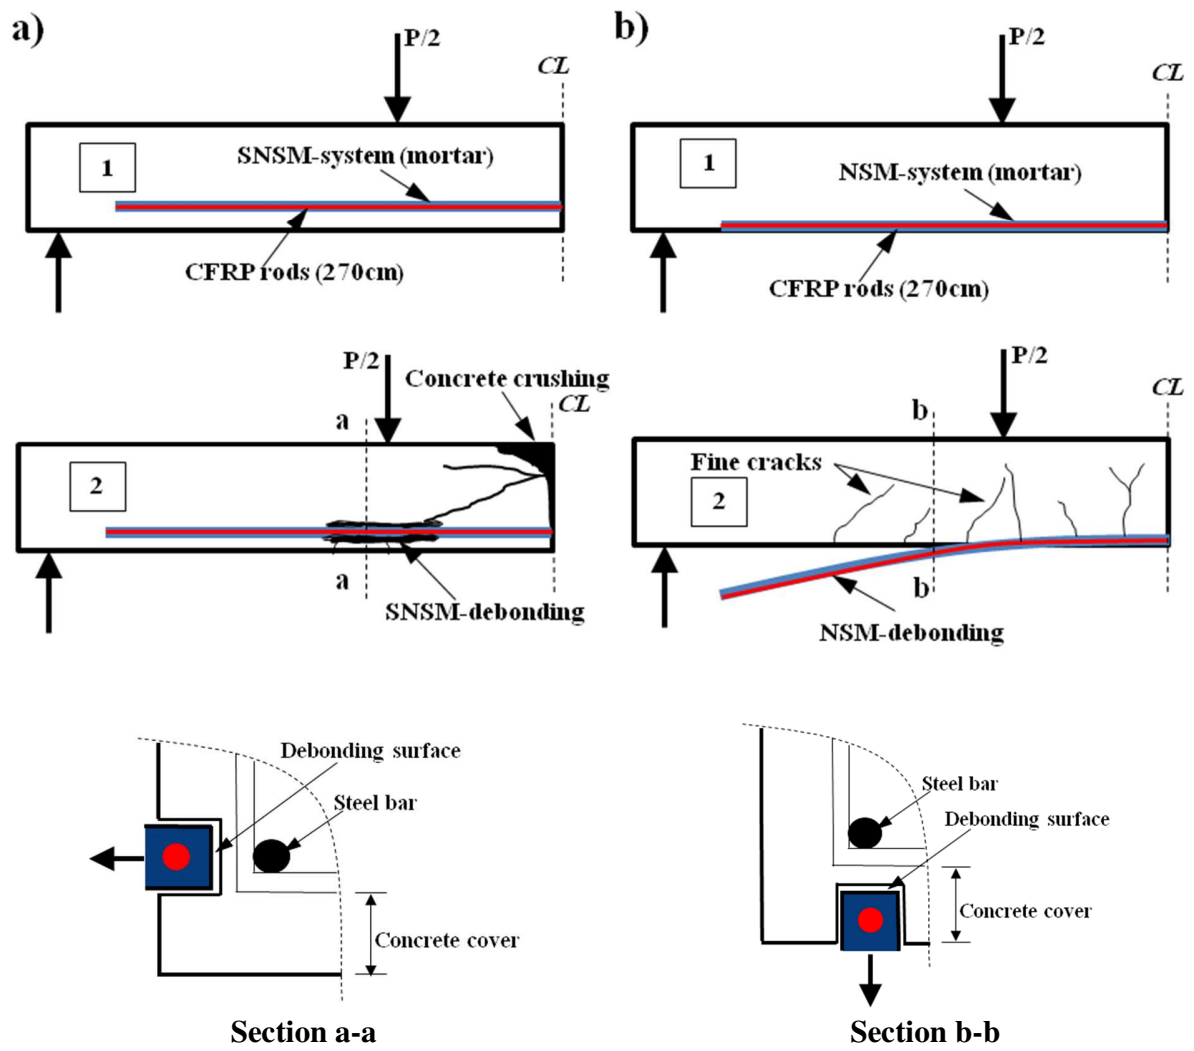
Debonding failure mechanism of : a) BC3(270-SM) beam and b) S-C6(270-M) beam
